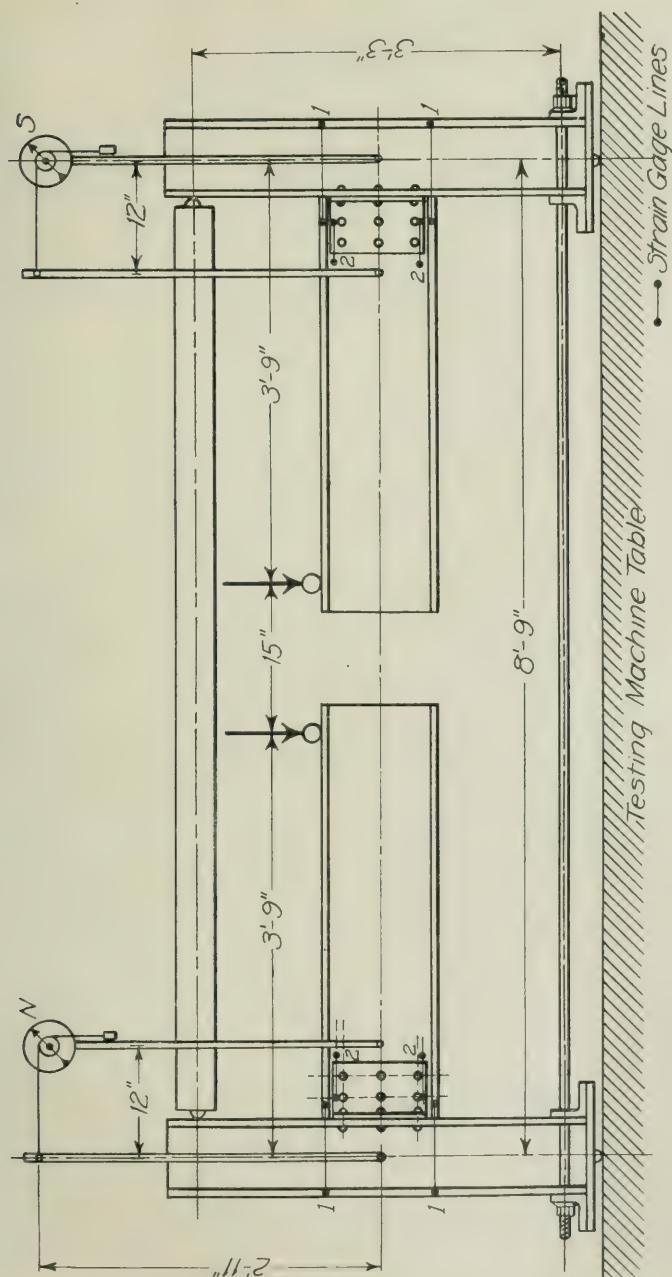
MEASUREMENTS OF ROTATION FOR TEST PIECES 46
